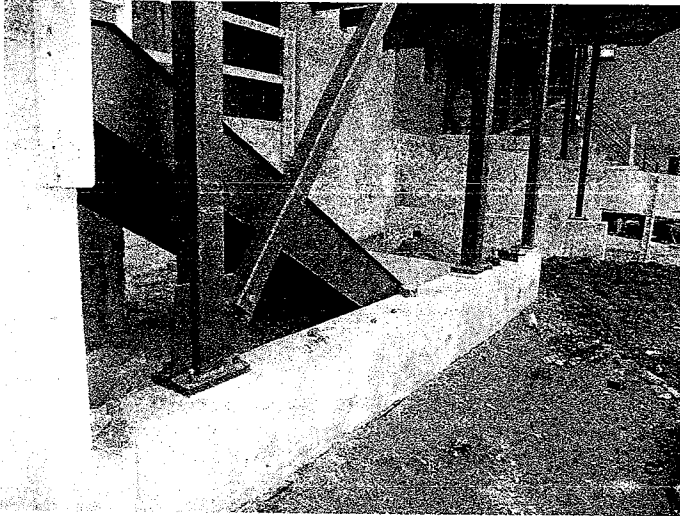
Structural Steel at Back Entrance (installation in progress)
